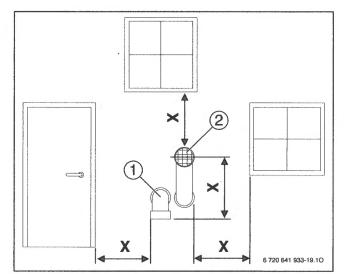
Vent and combustion air pipe position of a sealed combustion system
